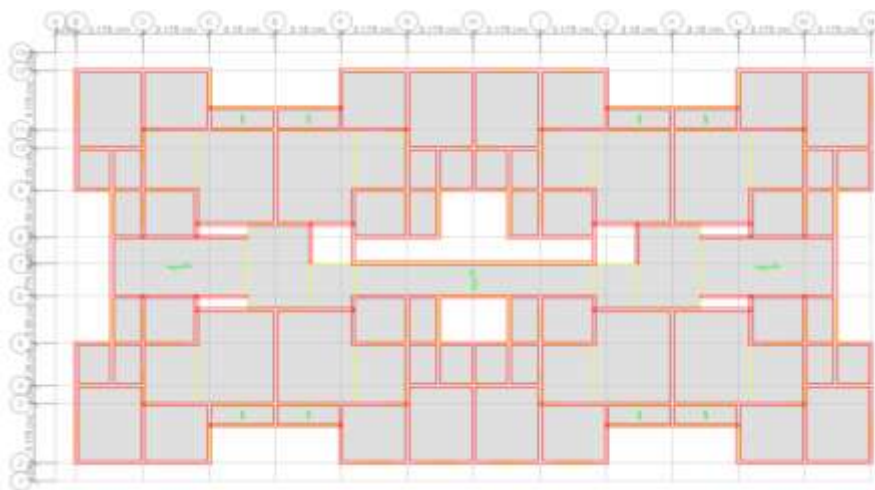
Floor Plan (typical) of the RC monolithic building in model
